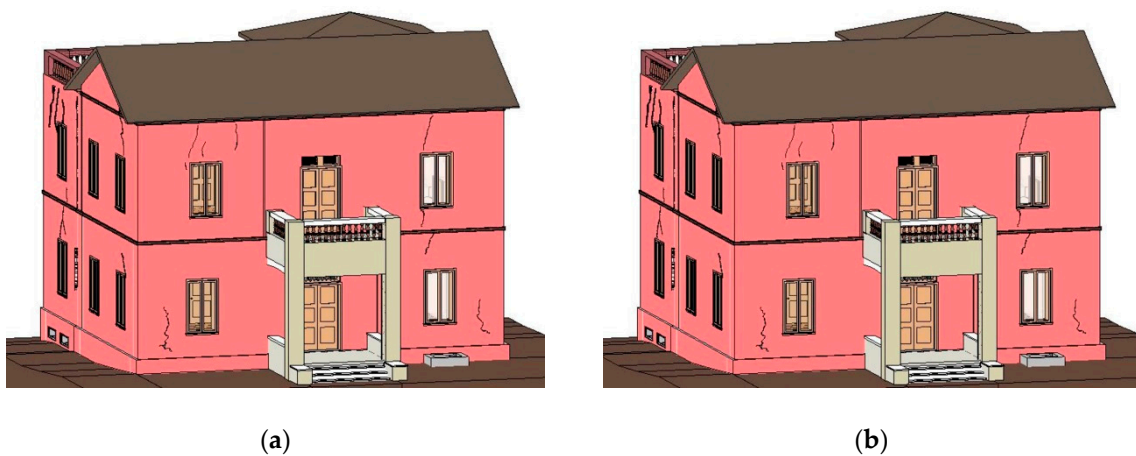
Elements of cracks (all types) embedded within the HBIM of the building: (a) southeast of the historic building; (b) southwest of the historic building.
